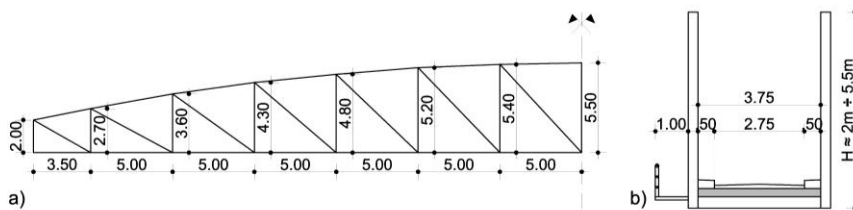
a) Side view of the superstructure of the bridge and b) Cross-section of the bridge
